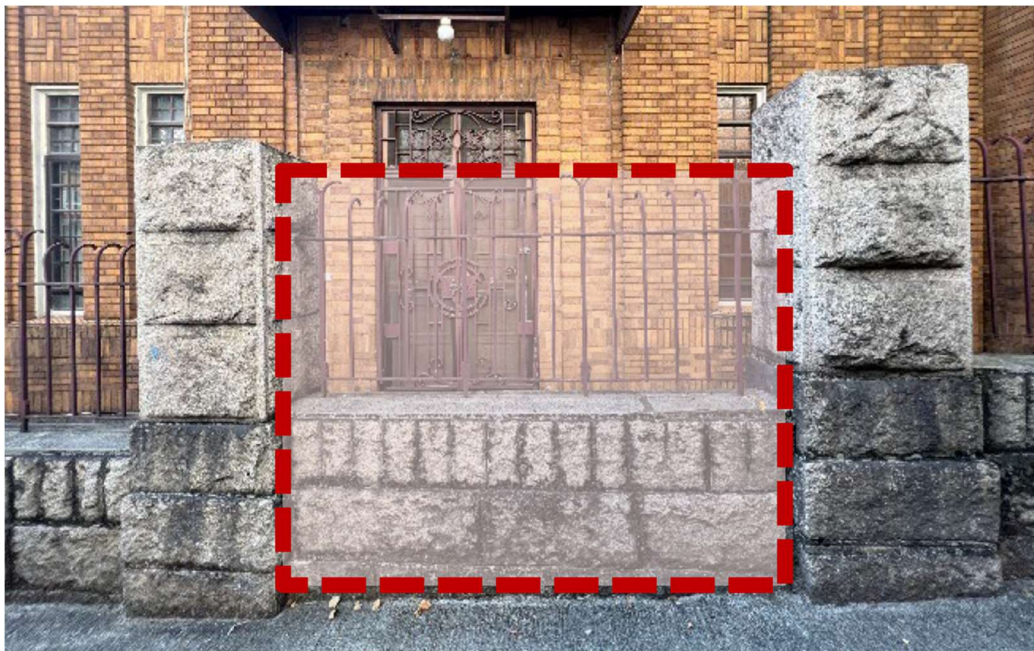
Extent of Fence Wall Affected (red dashed line)
